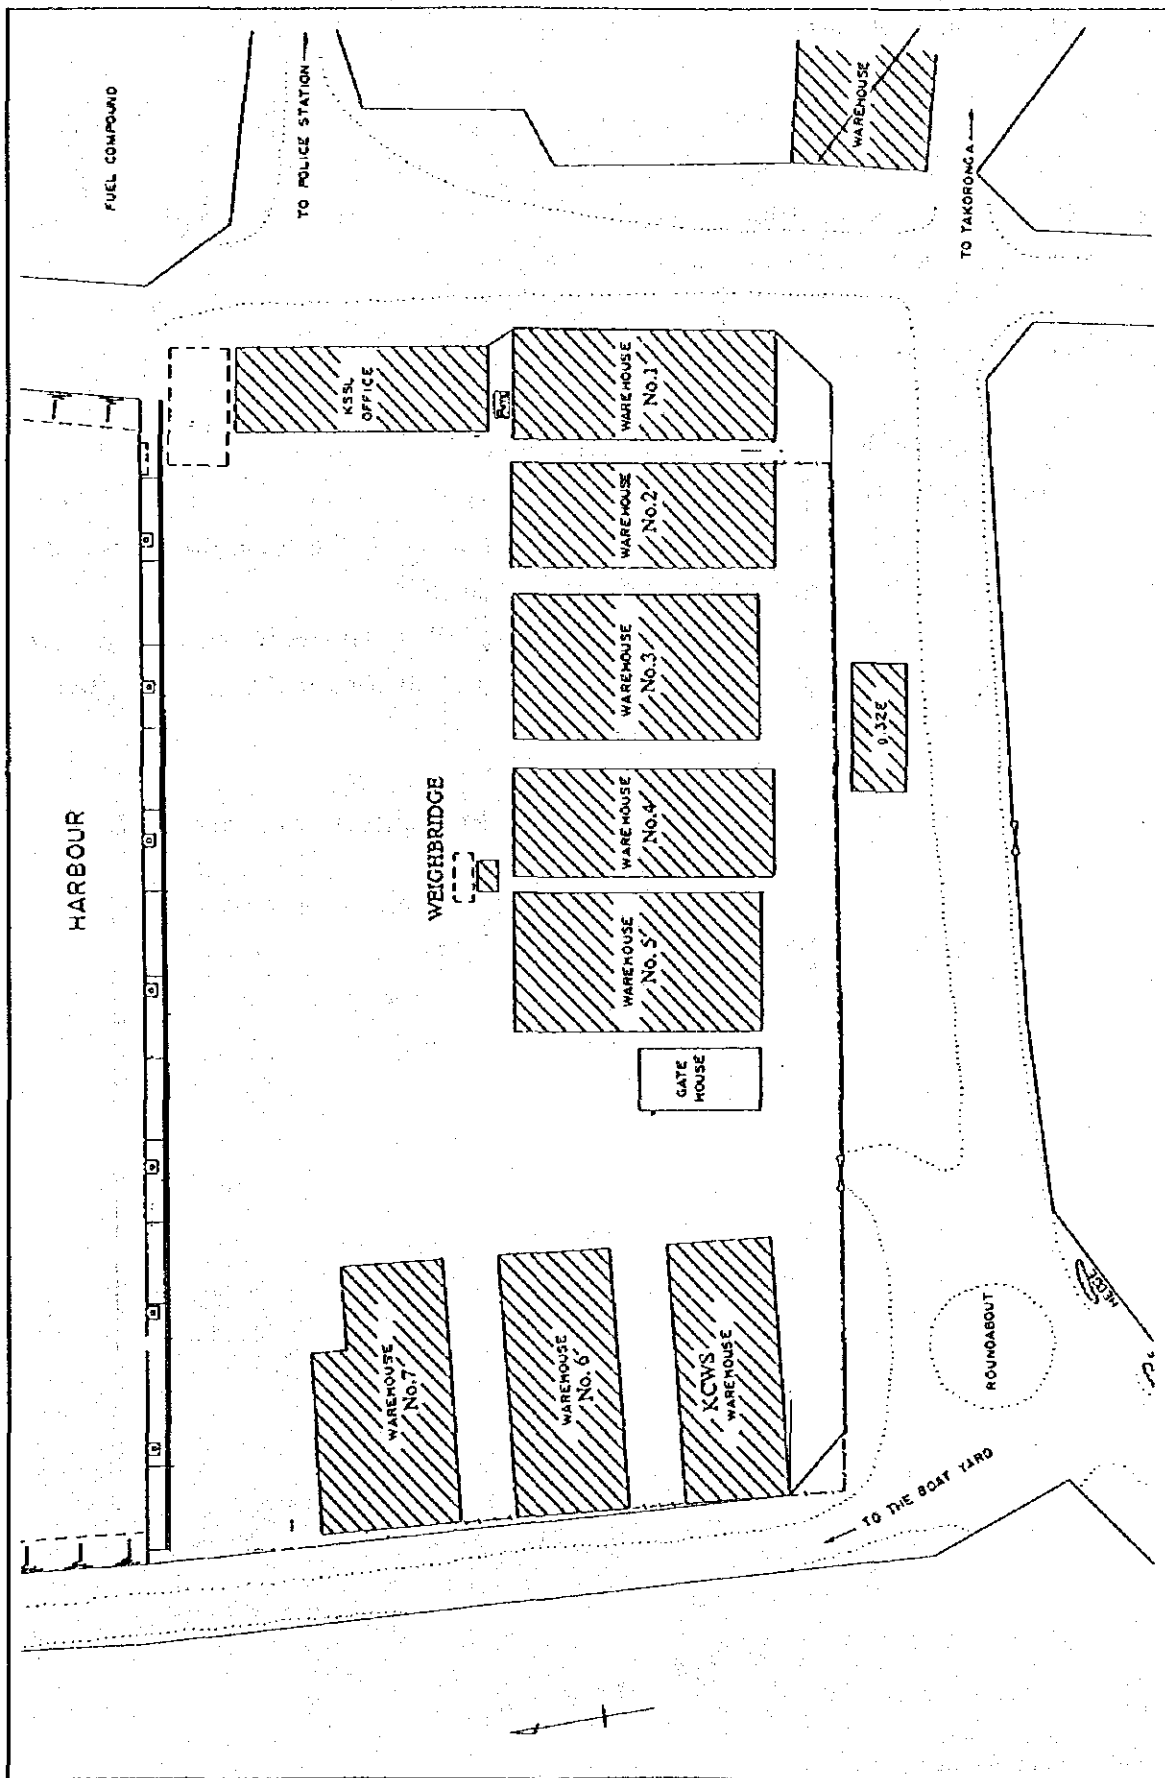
Layout of Open Yard, Sheds and KSSL Office in Betio Port
